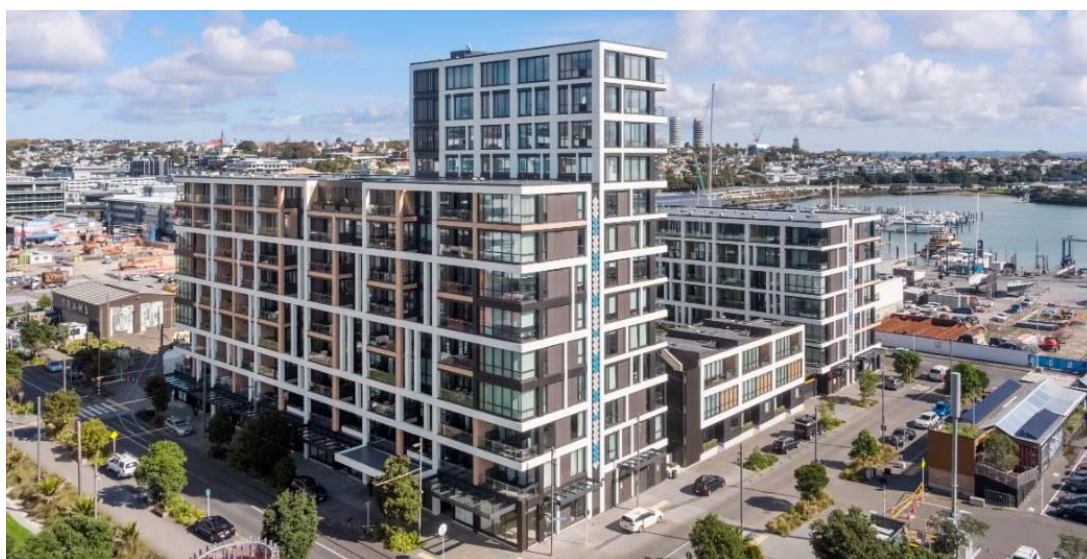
The 10-13 storey 30 Madden Street building in the Wynyard Quarter.
